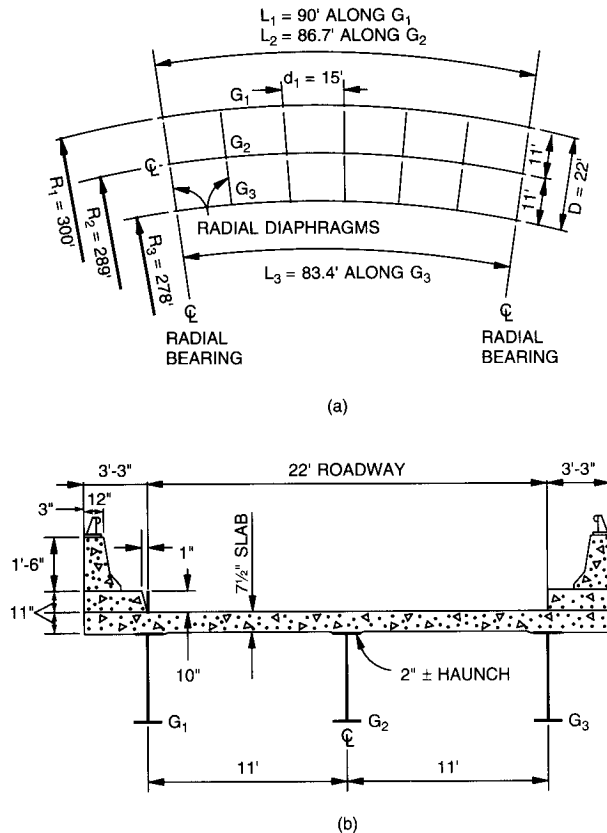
Two-lane highway bridge with curved stringers. (a) Framing plan. (b) Typical cross section.
